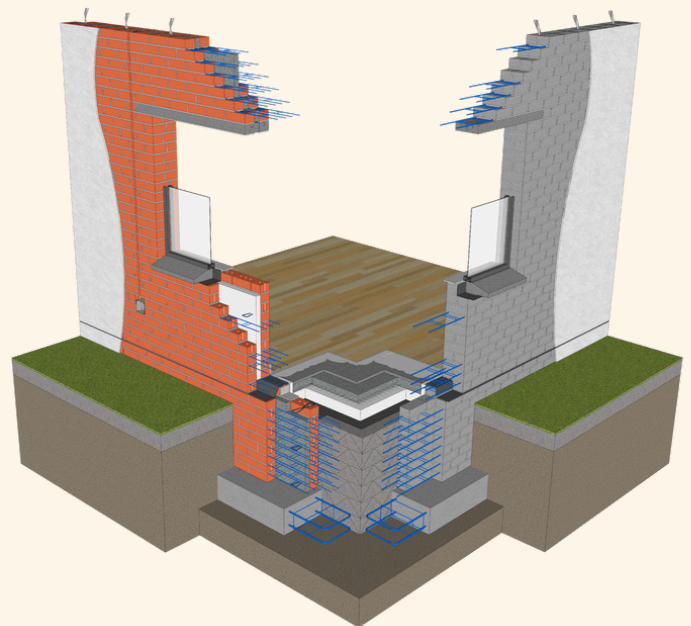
Fig A: Cem Brick Thermal Brick wall vs Clay cavity wall
